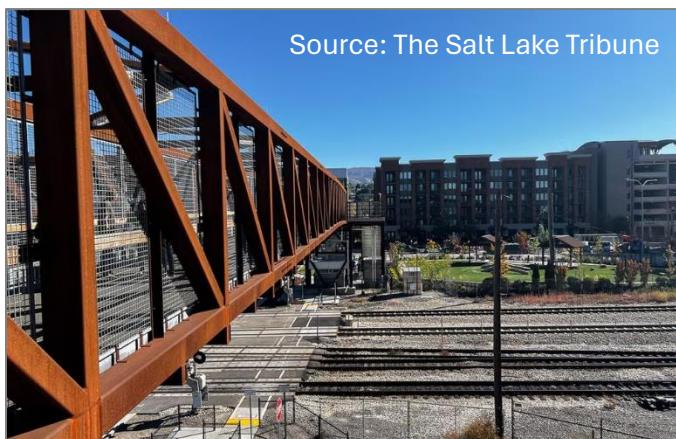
A new pedestrian bridge over the railroad tracks at 300 North.
